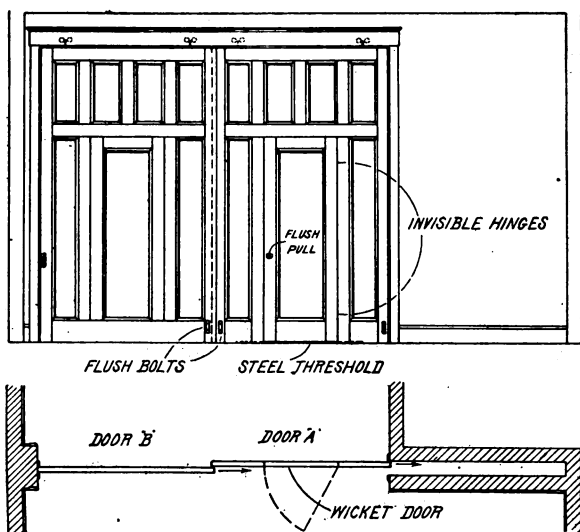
PLAN AND ELEVATION OF A PARALLEL PARTITION WITH WICKET DOOR
